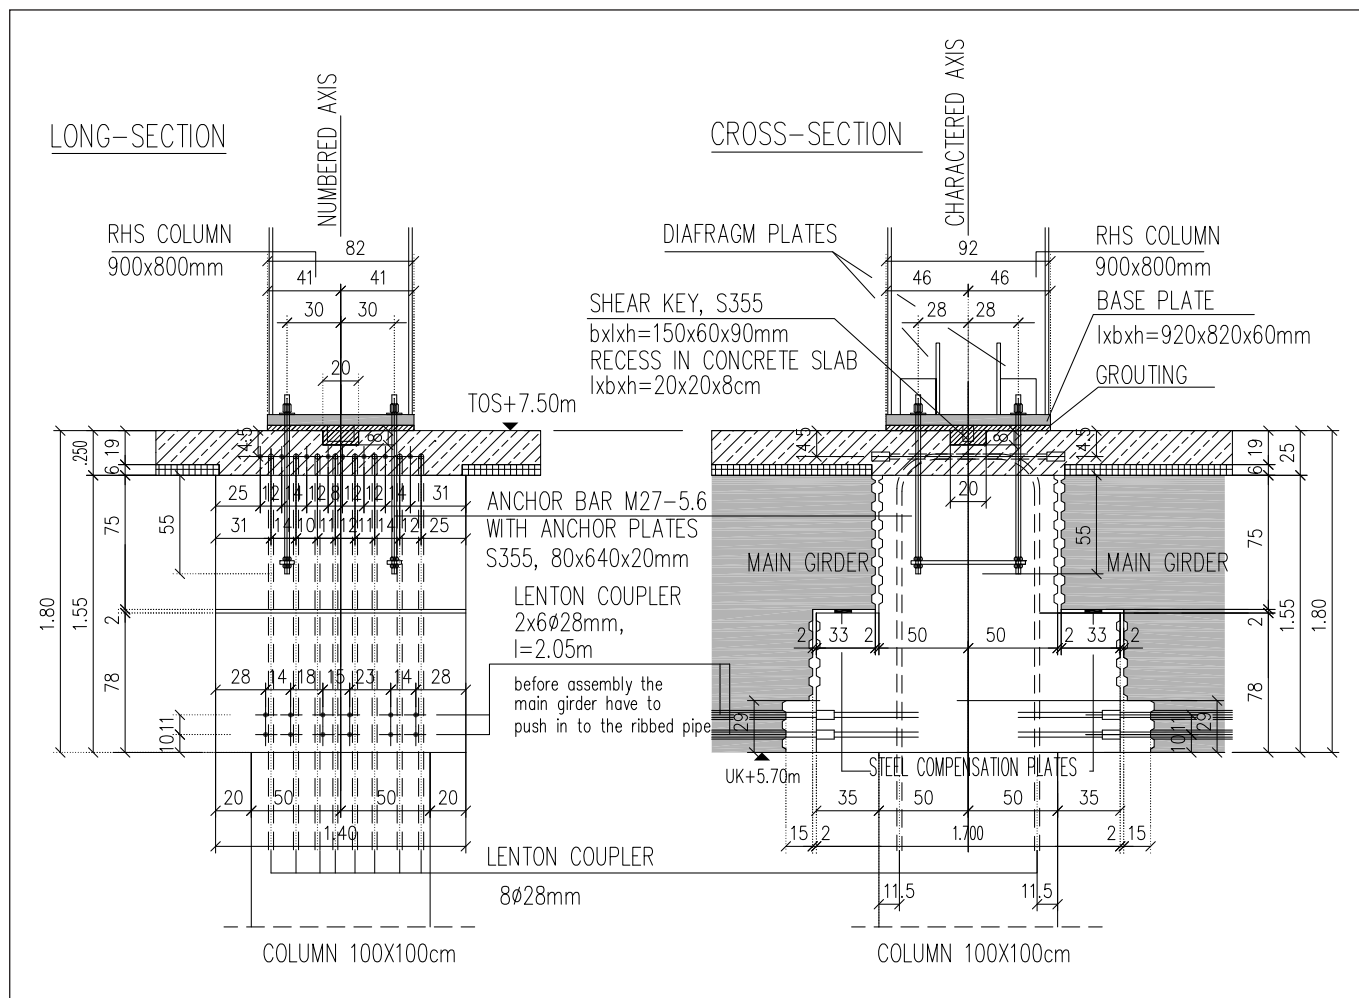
Column-main girder rigid connection detail (detail from tender document)
